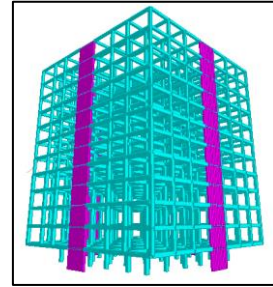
Floating column at outer periphery and shear wall at 4 sides of the building
